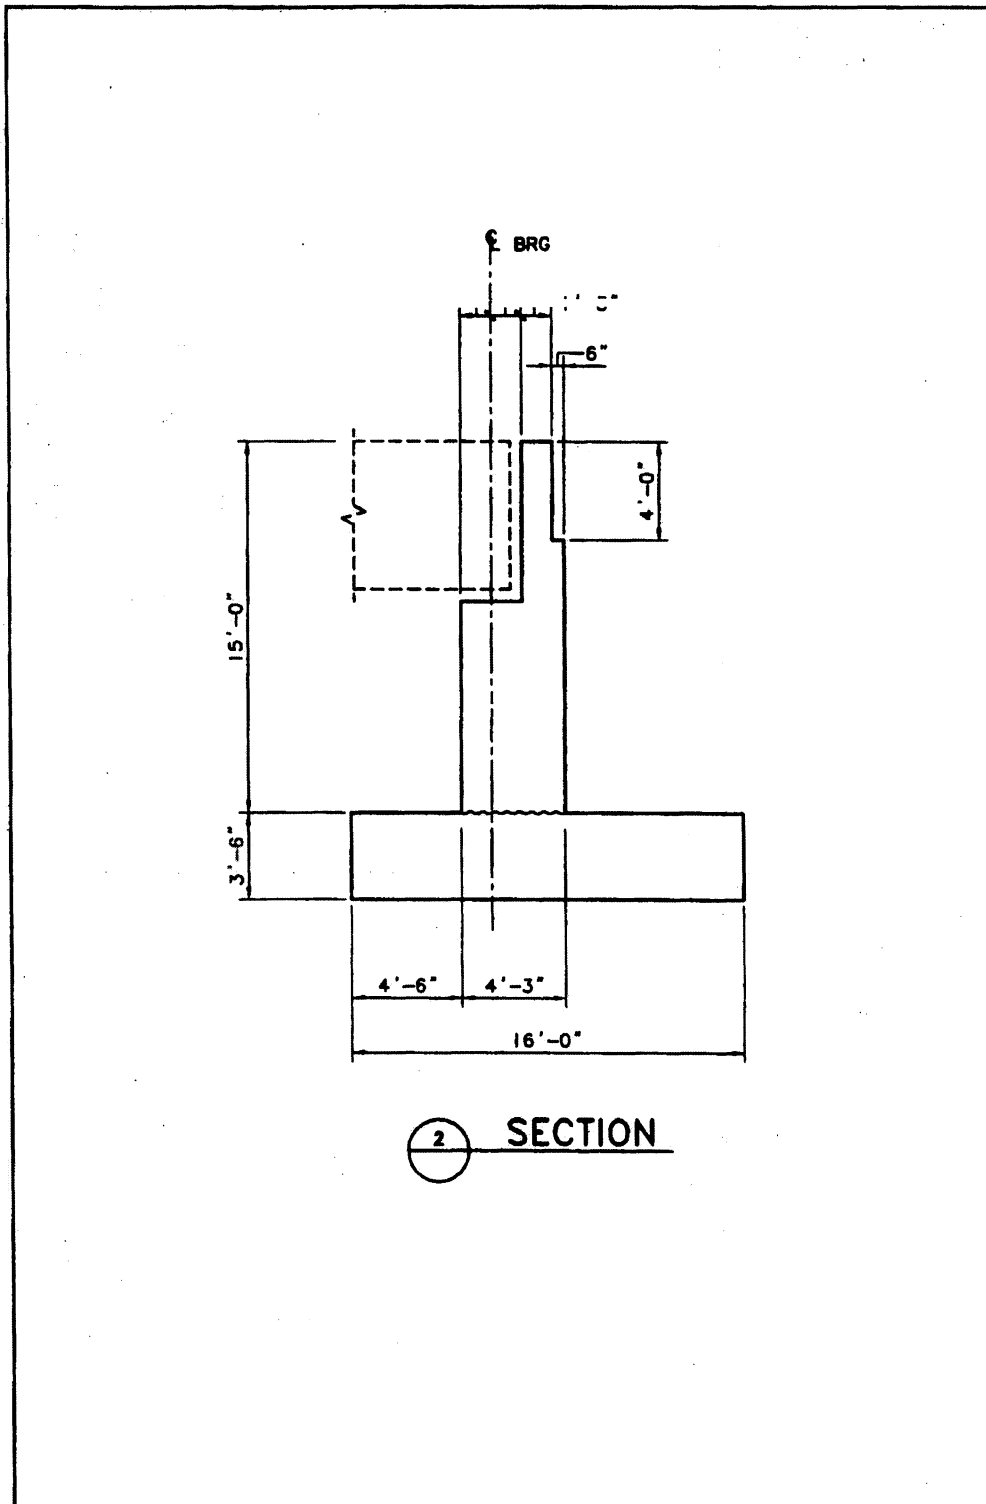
Bridge No. 2 – Seat Type Abutment
